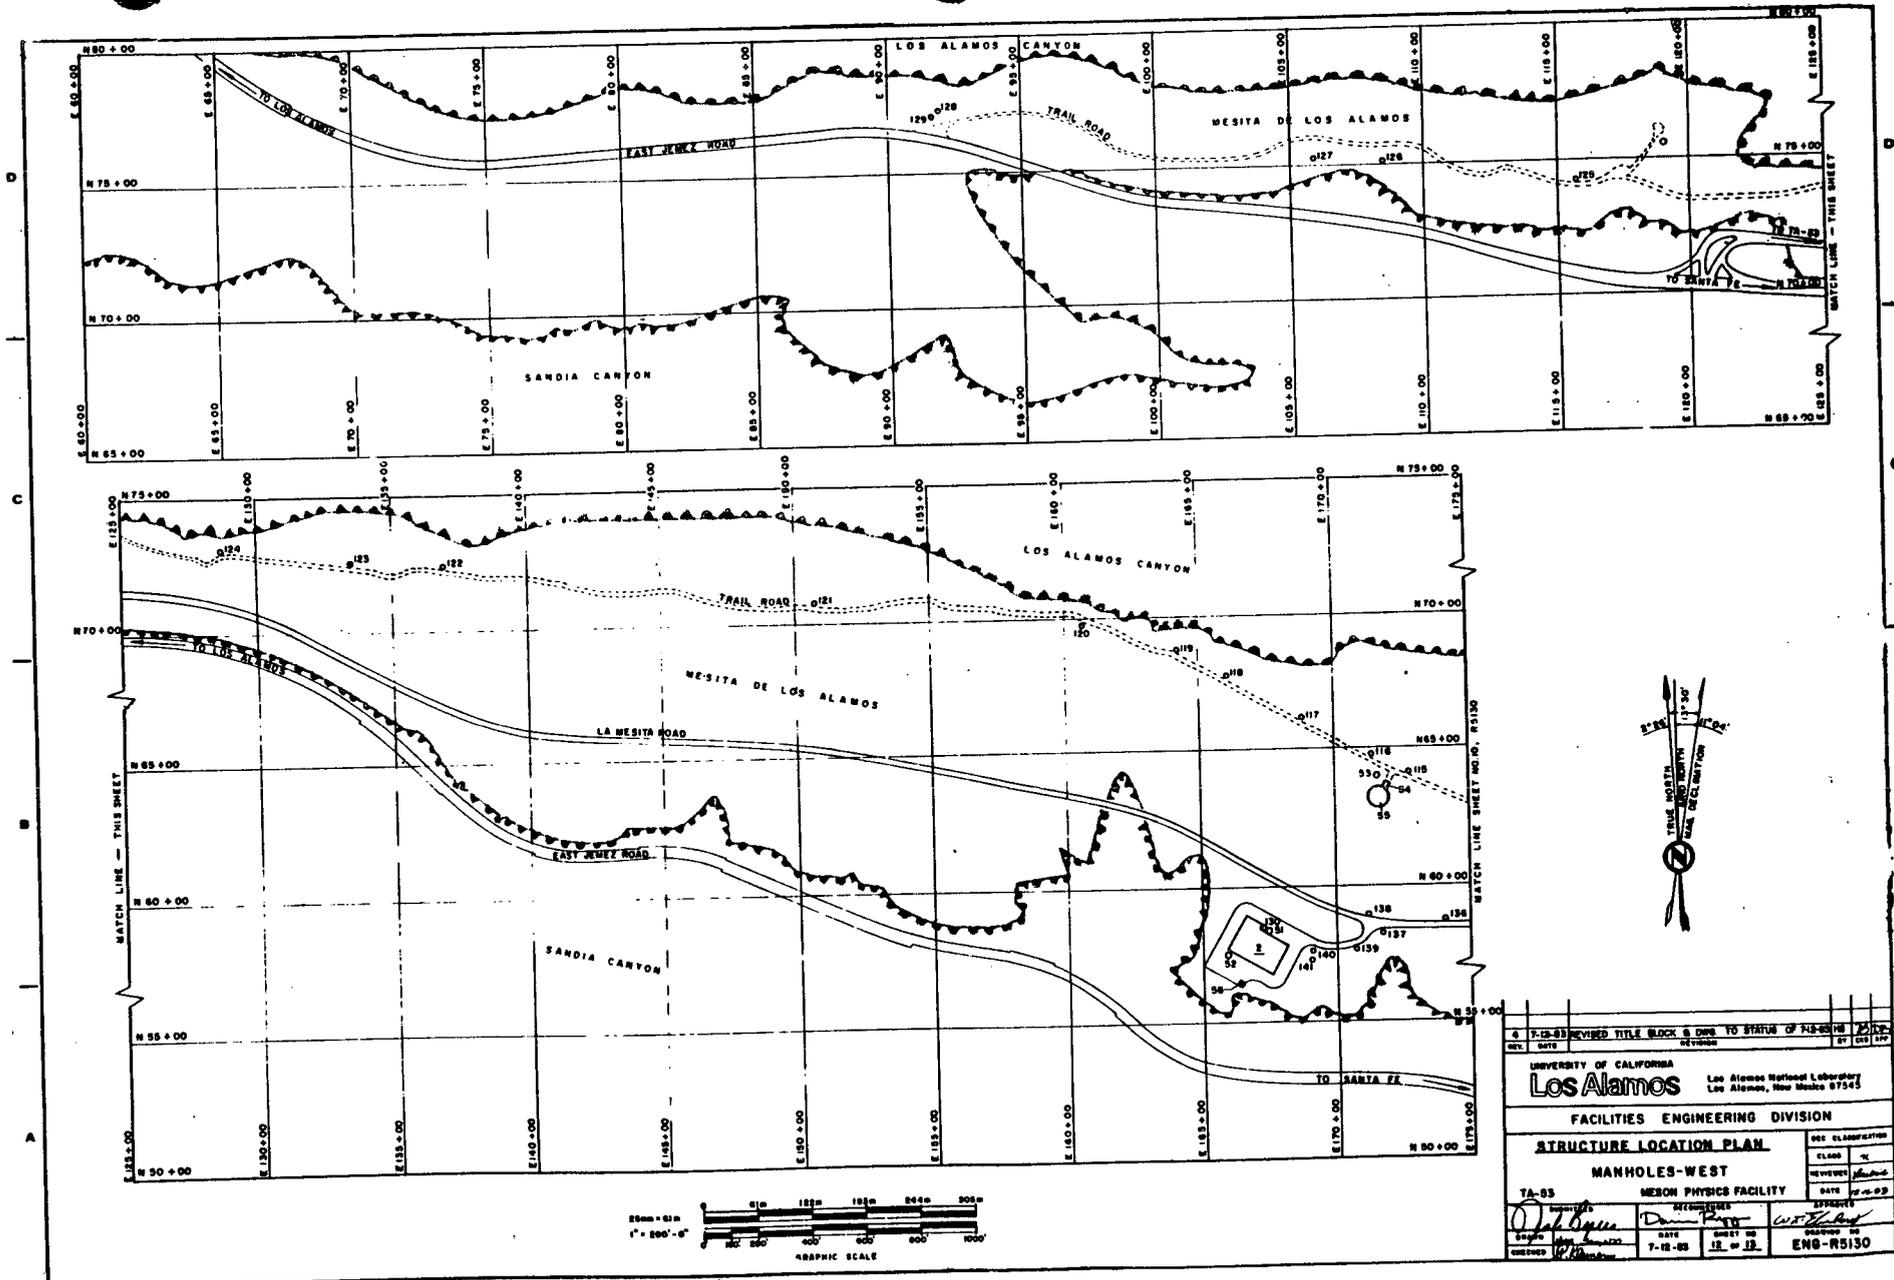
Structure Location Plan for TA-53 - Meson Physics Facility (1983 Drawing from the LANL Technical Area Structure Location Plans)
